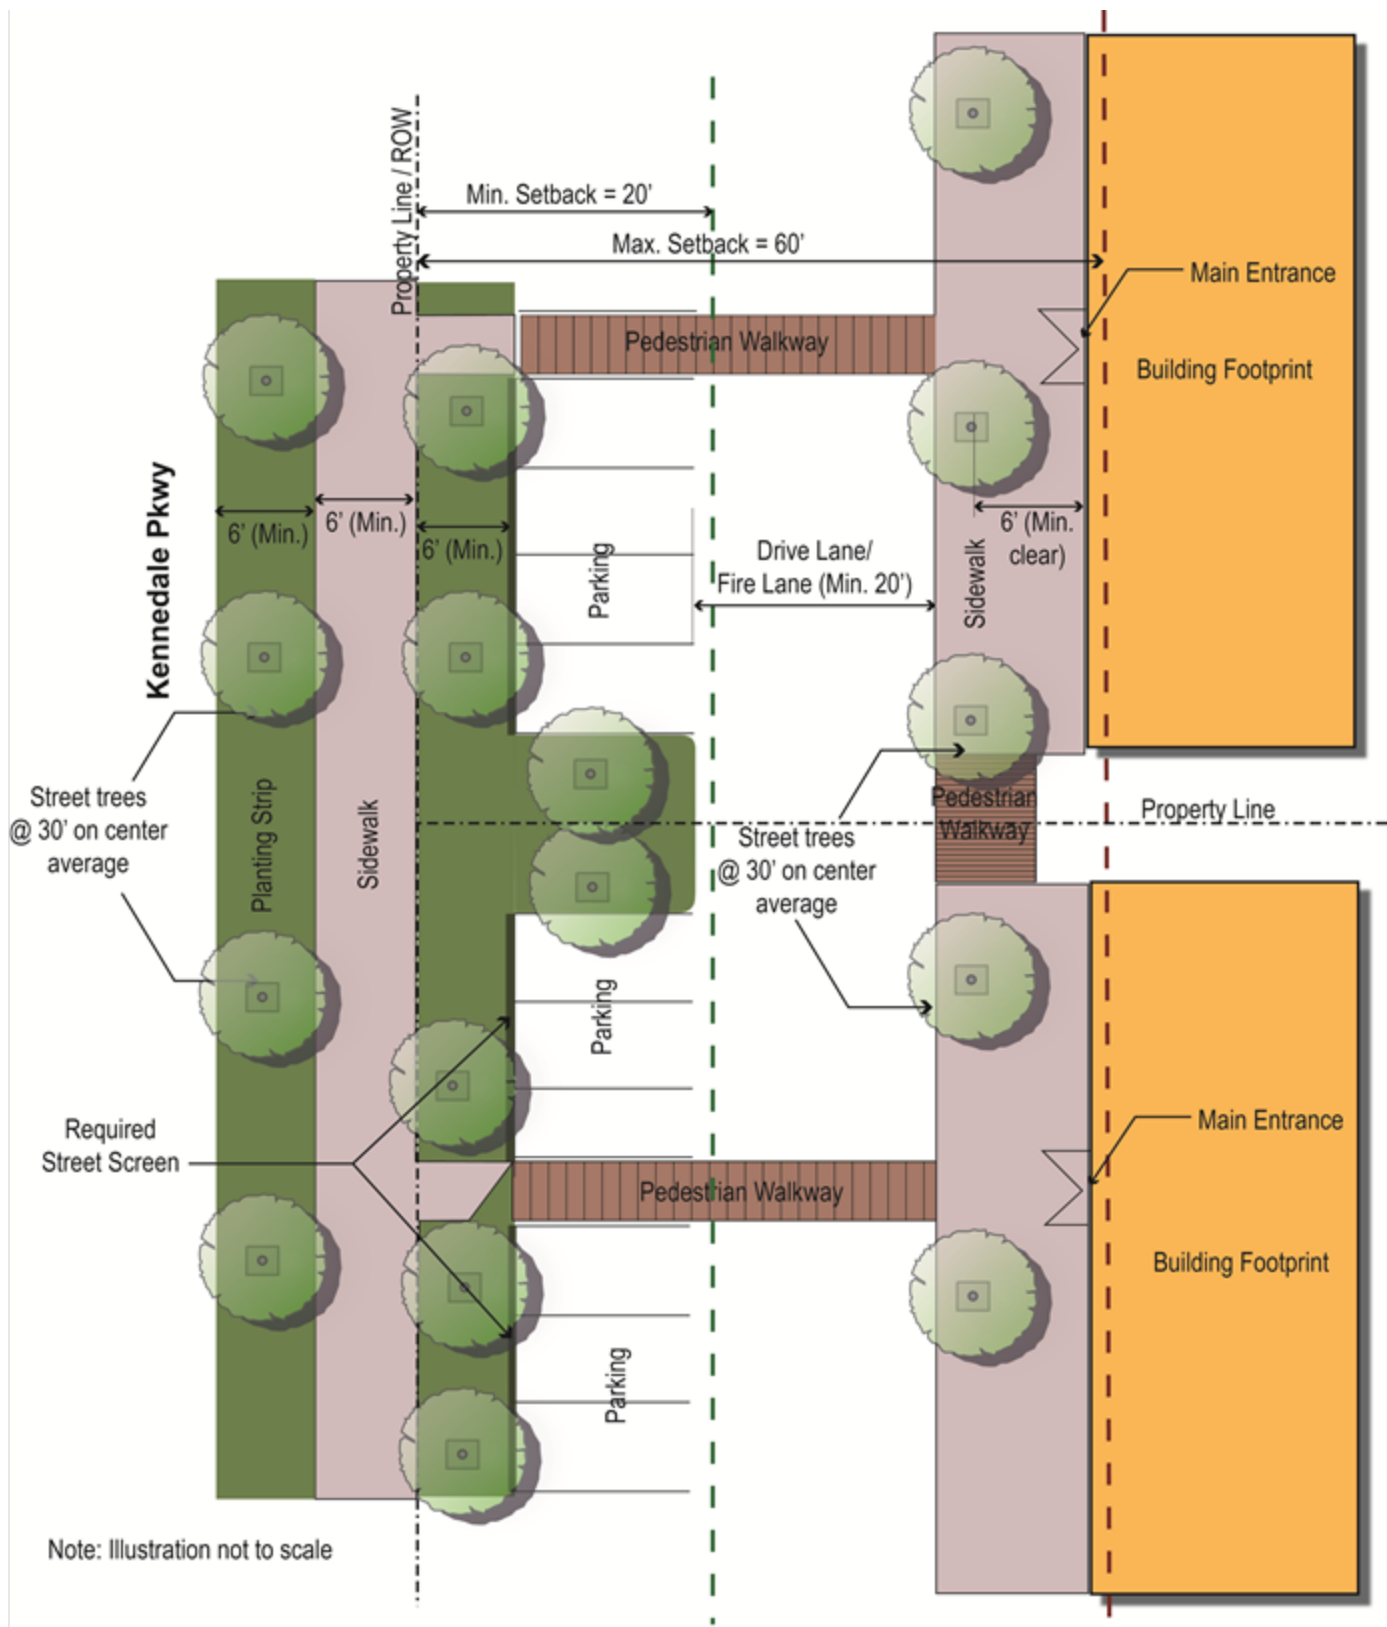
Example of parking area showing required streetscape and site design for properties along Kennedale Pkwy.
